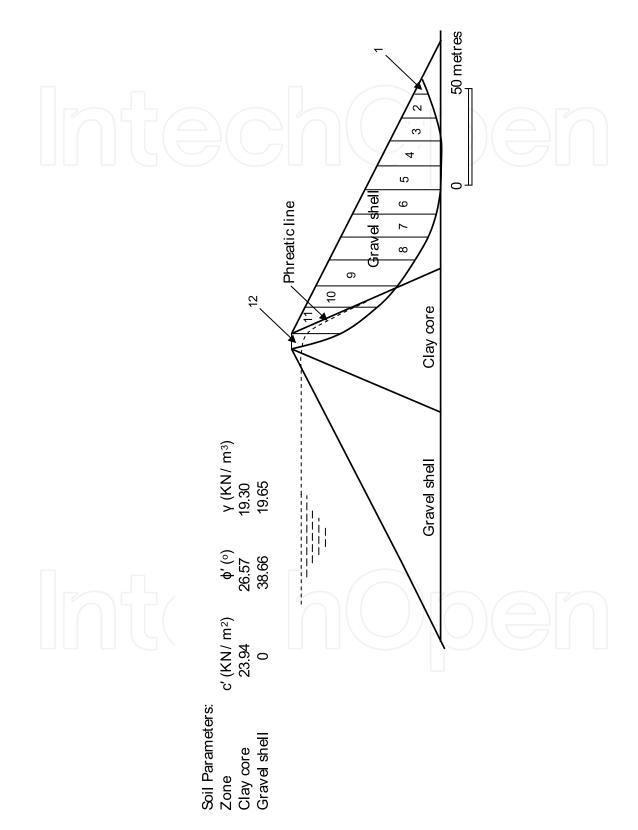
Downstream section of an earth dam embankment (Modified from Sherard et al, 1978)
